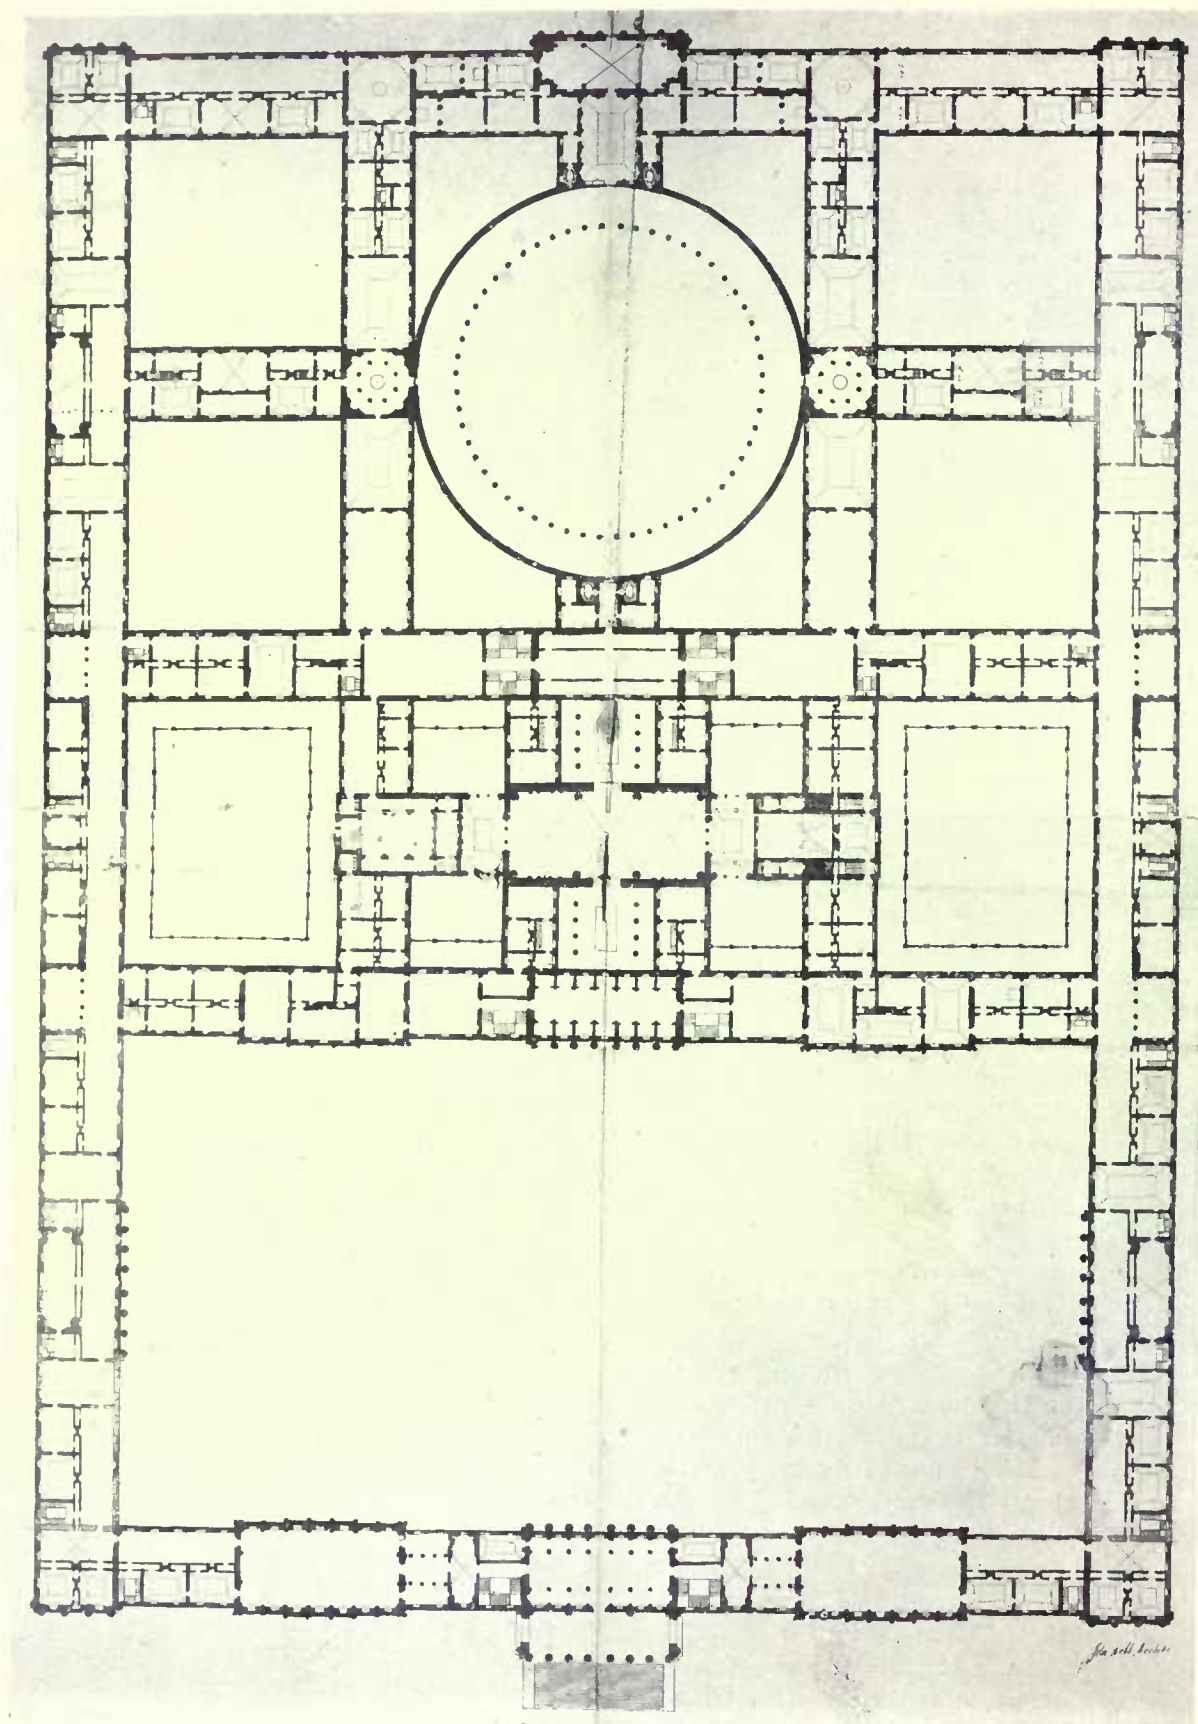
GROUND-FLOOR PLAN OF ANOTHER DESIGN, SIGNED BY JOHN WEBB
